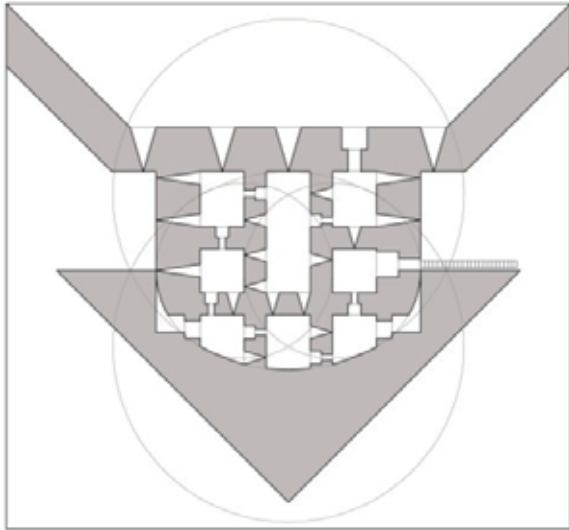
Redrawing of plan from sheet 55 (F. Colonnese)
